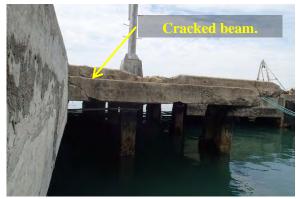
Bulkhead wall connecting RC Pier/ Trestle.
